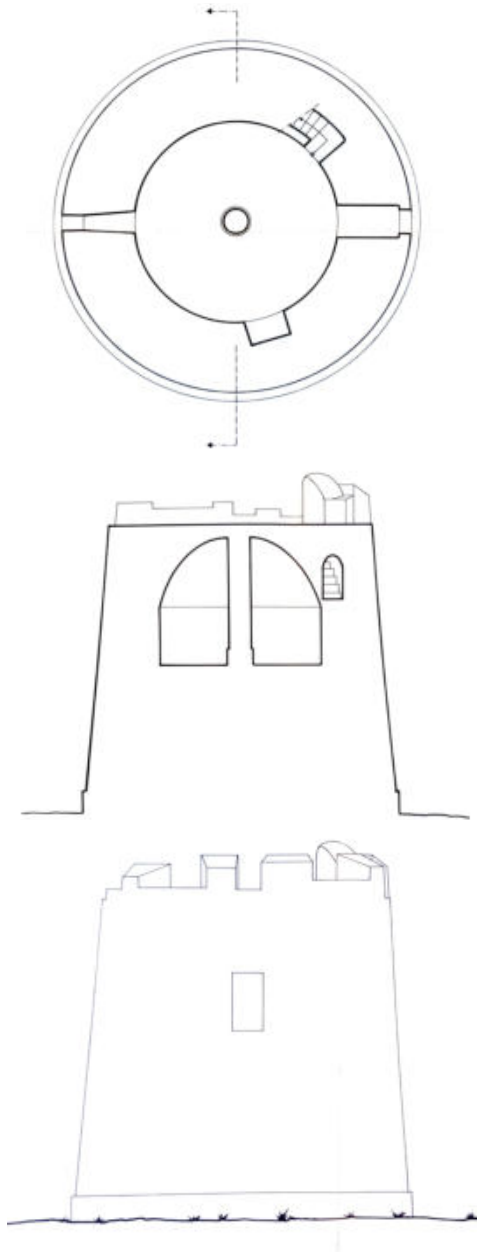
Plan, section and north elevation of the Piscinni Tower (Montaldo, 1984)
